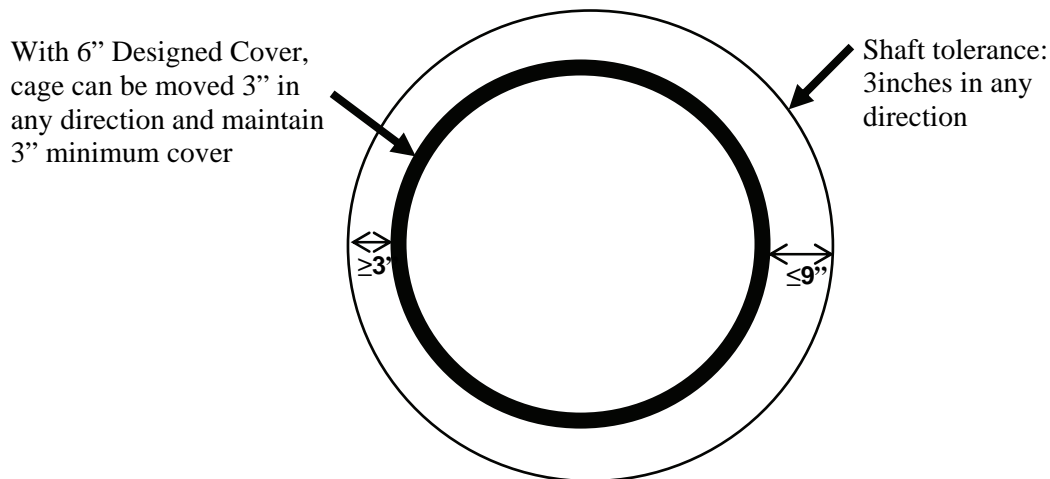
Adjustment to Drilled Shaft Reinforcement for Alignment to Column Cage
